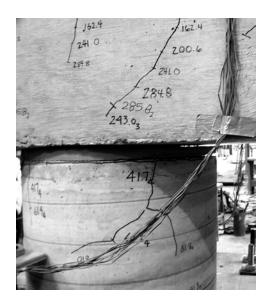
CBC4 Bedding and Column Crack Patterns at Factored-Level Load
